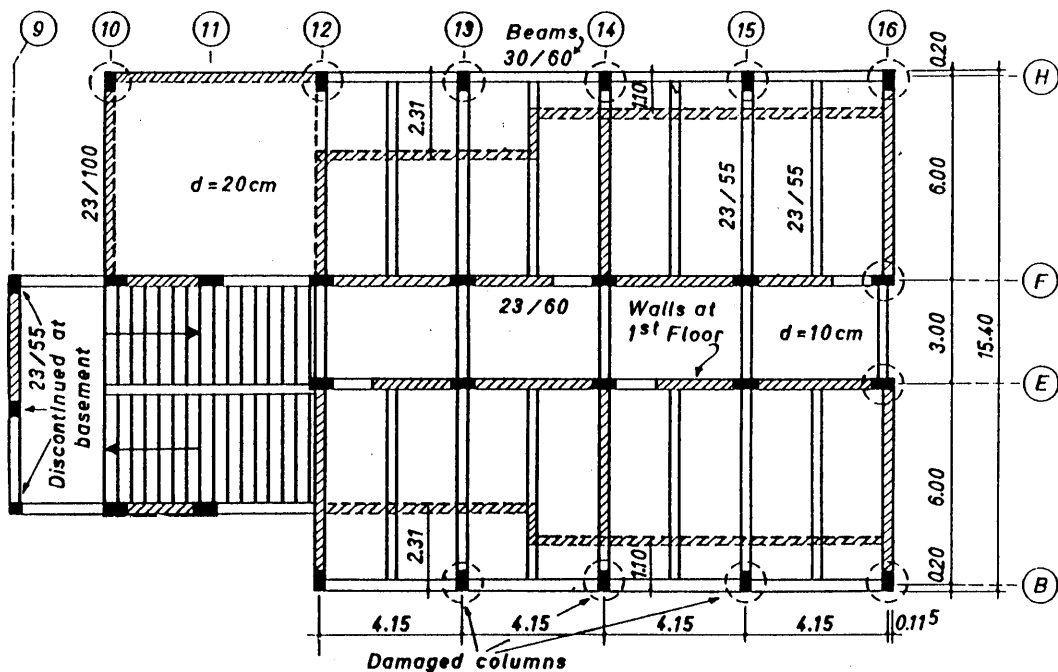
FLOOR PLAN - HIGH SCHOOL BUILDING
